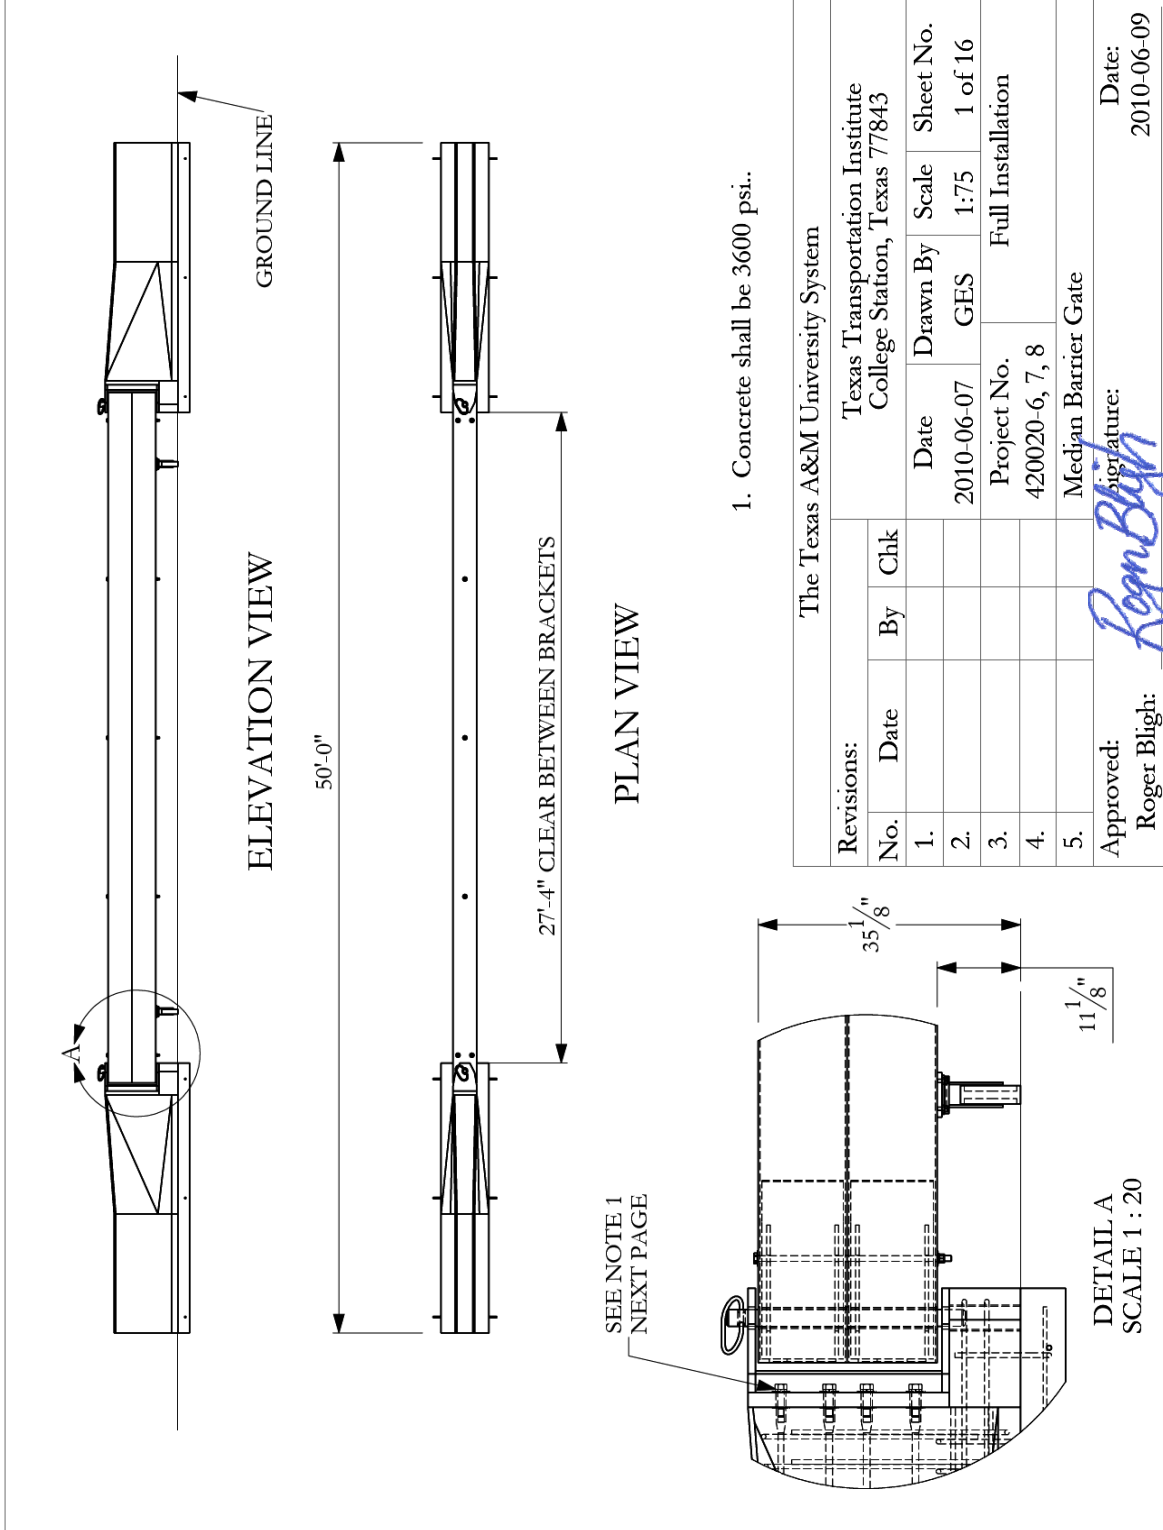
Details of the TxDOT Median Barrier Gate Installation.
